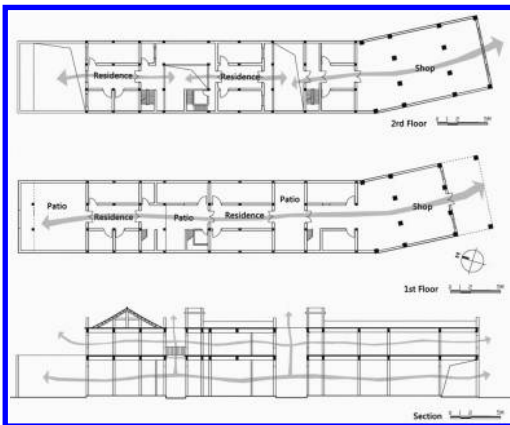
The layout and ventilation schematic diagram of an arcade building in Haikou.
